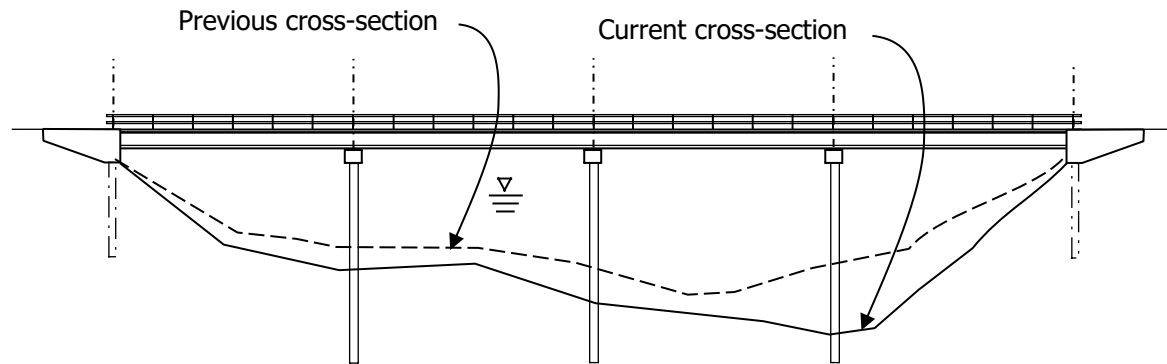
Elevation view showing current cross-section and previous cross-section for a bridge over water.
